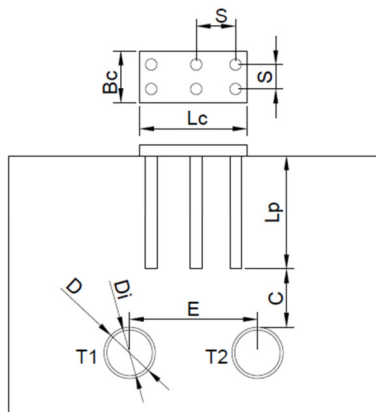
The location of the twin tunnel in relation to a group of piles (not in scale).
